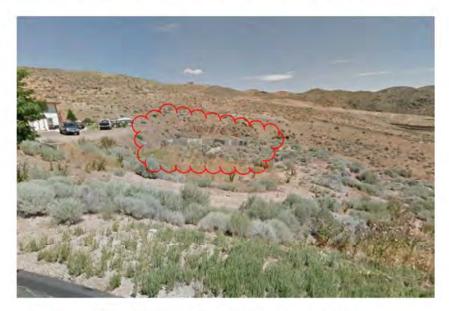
(Existing Foundation - Google Earth Image August 2011)
